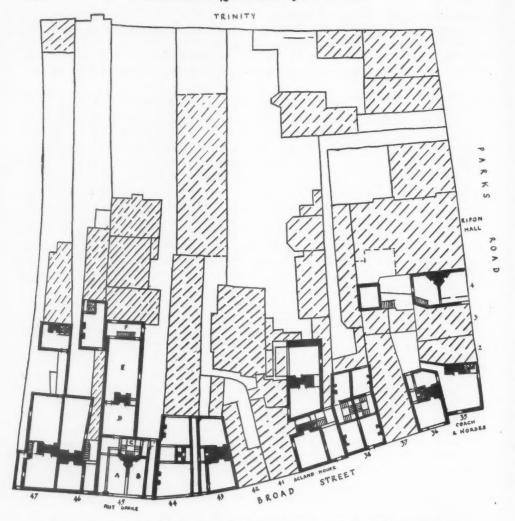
Plan of the demolished houses in Broad Street, Oxford, on the site of the New Bodleian.
